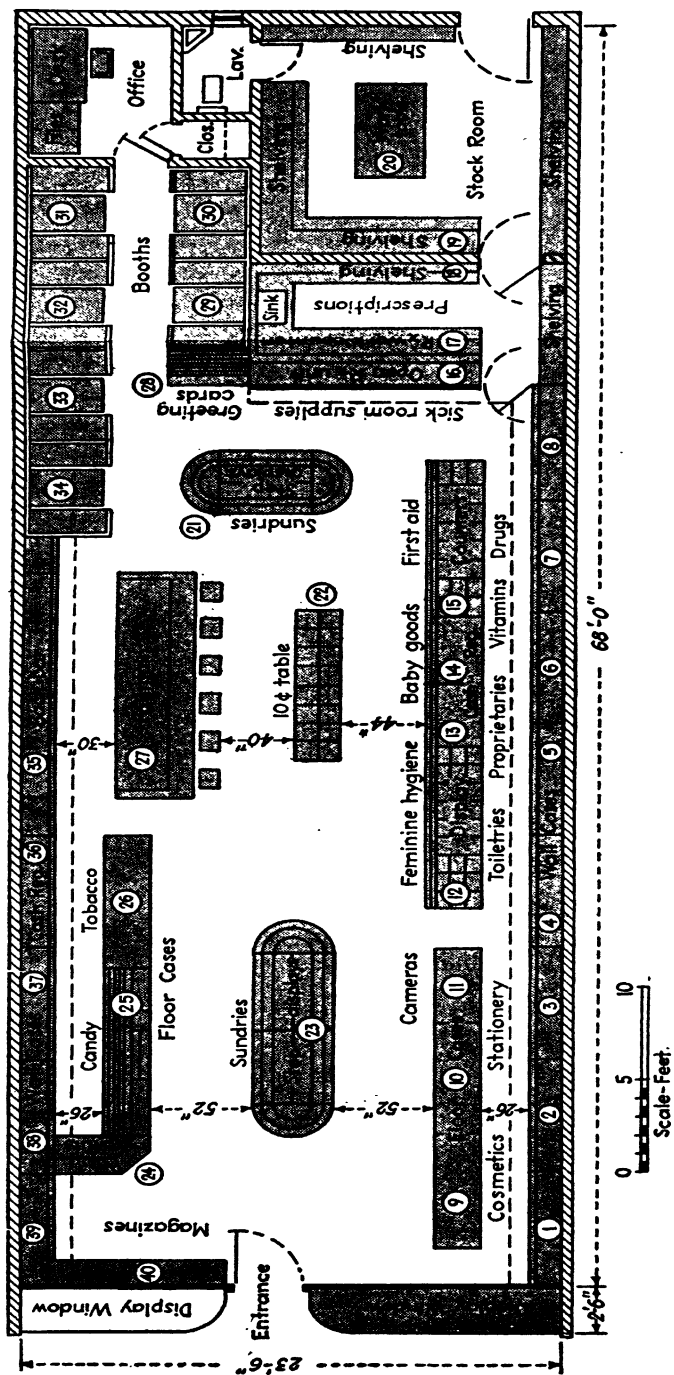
Model floor plan for an individually owned two- or three-man drug store. (Drawn from a floor plan designed by the authors.)
